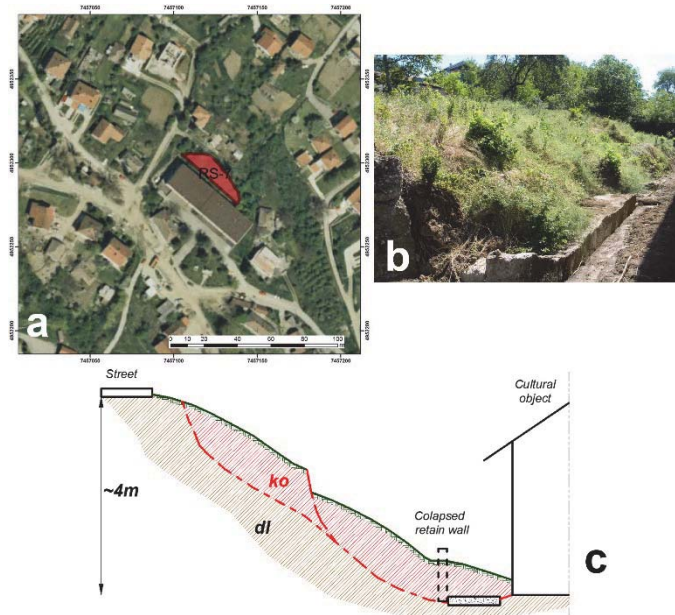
a) orthophoto of recorded landslide b) image of damaged retain wall c) geological cross-section (sketch)
